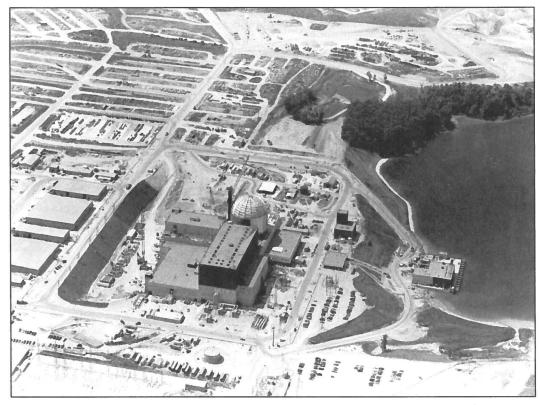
Construction Photograph of CPS Looking West, May 1982
